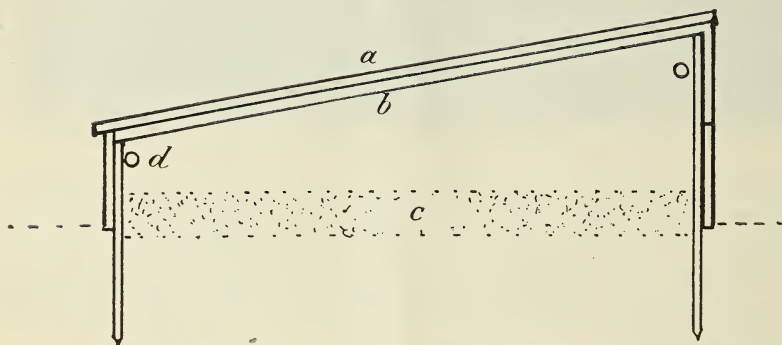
Cross section of frame provided with two lines of heater pipes for use in case of low outside temperature: *a*, Glazed sash; *b*, crosspieces to support sash; *c*, special soil; *d*, heater pipes. Outside width of bed, 5 feet 10 inches
